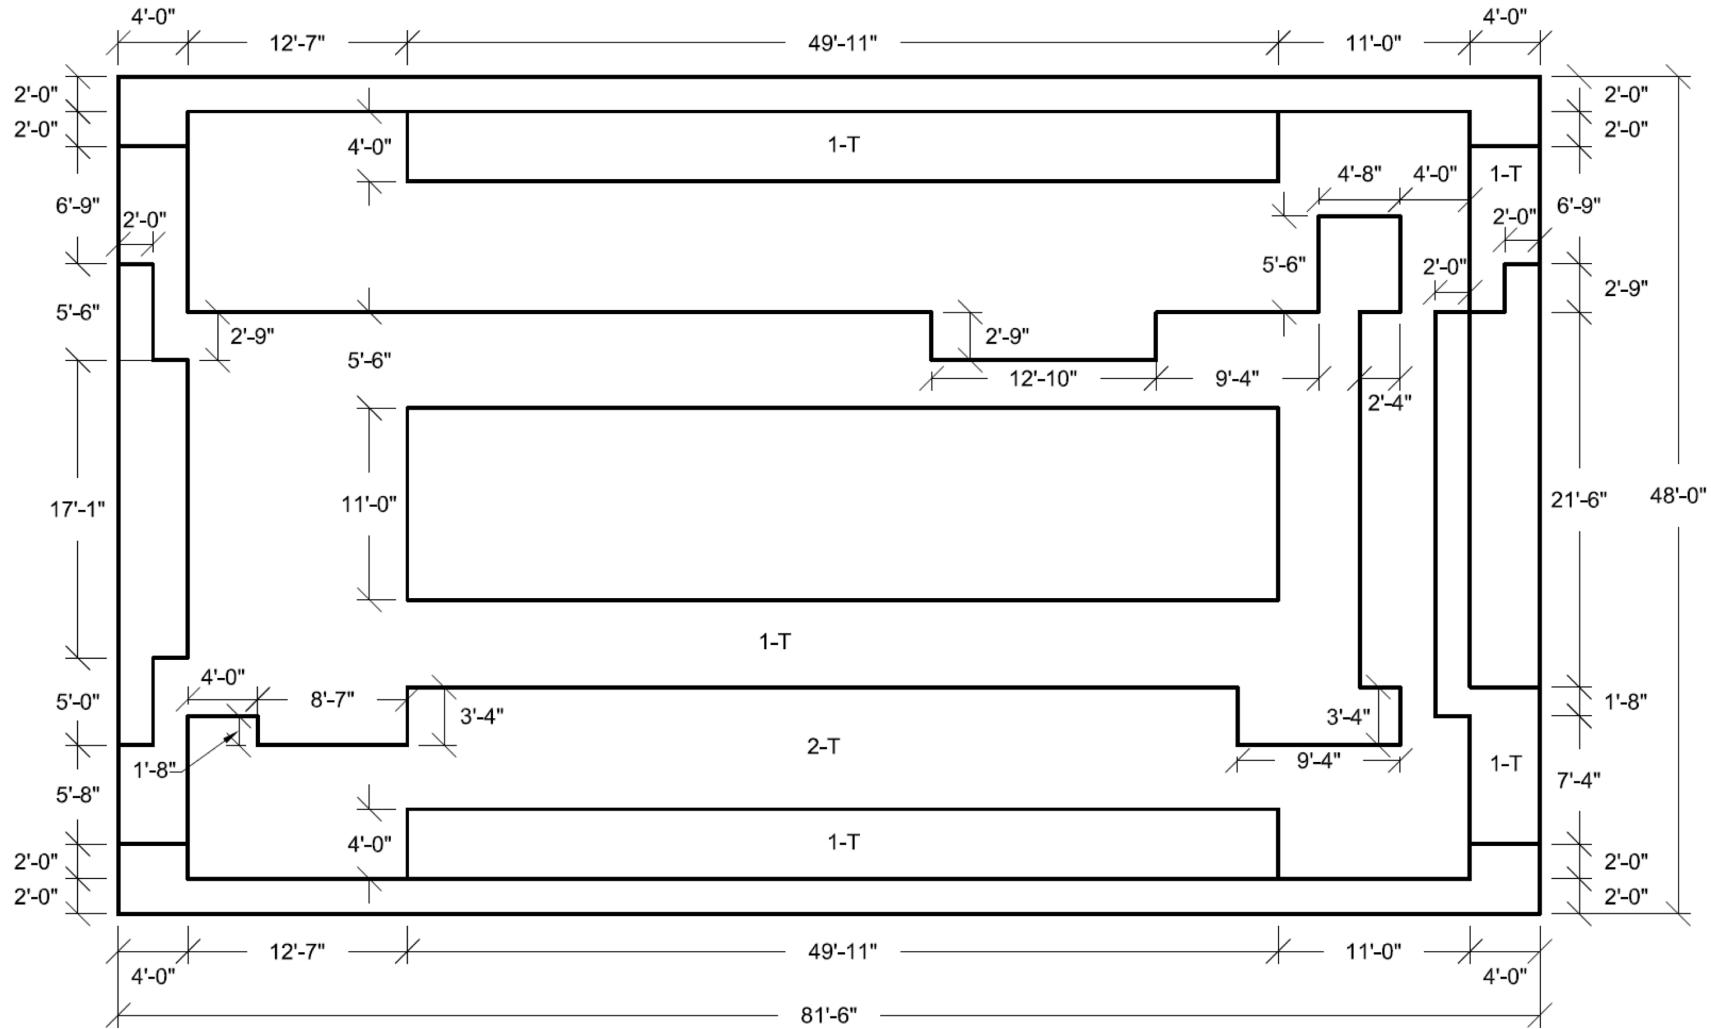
H.6-146 DGFOSV Slab 1 Looking Down Transverse Reinforcement Zones
